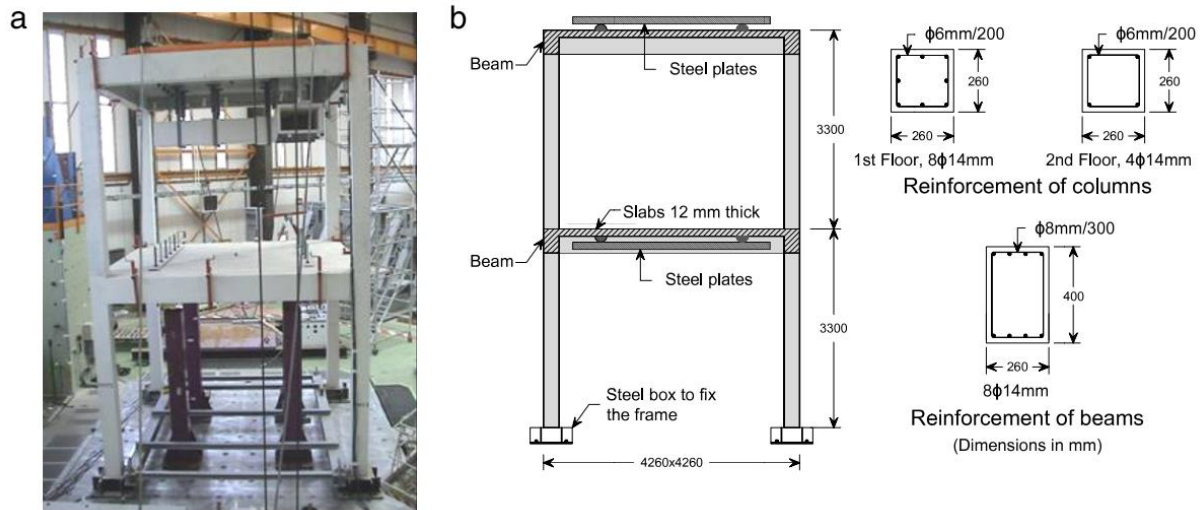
(a) General view and (b) frame geometry and sectional details. (Garcia et al., 2010)
